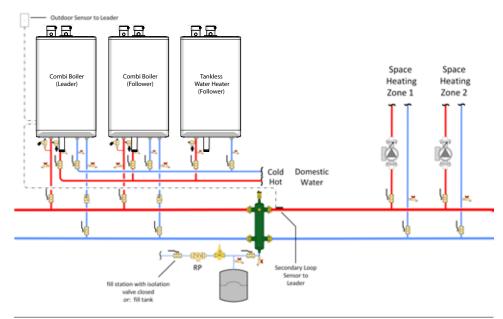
Typical Combi Boiler and Tankless Water Heater cascade piping – concept drawing. This drawing is only a simple schematic guide
